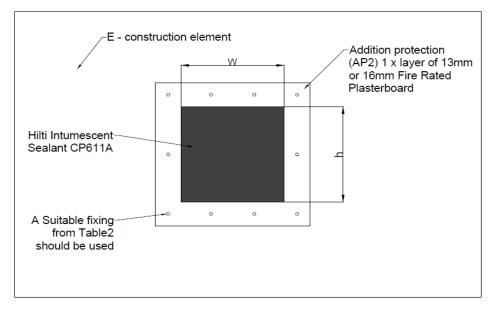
Blank Wall, Seal, Front View of seal 1, See table 6
